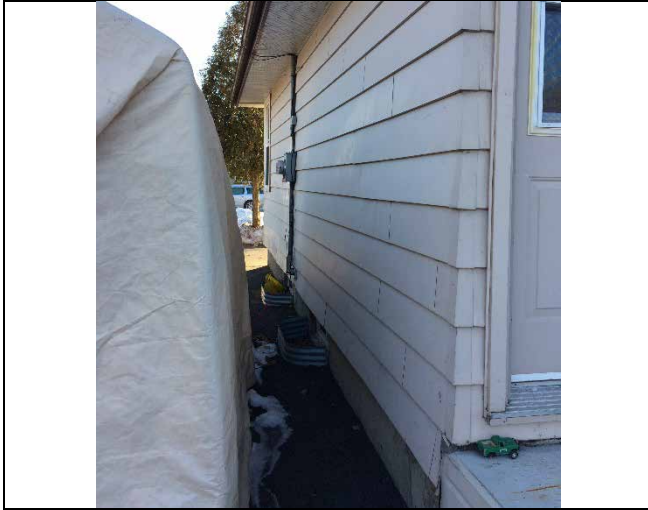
Presumed asbestos-containing exterior door / siding caulking - pink at the back exterior of 84 Brighton.
